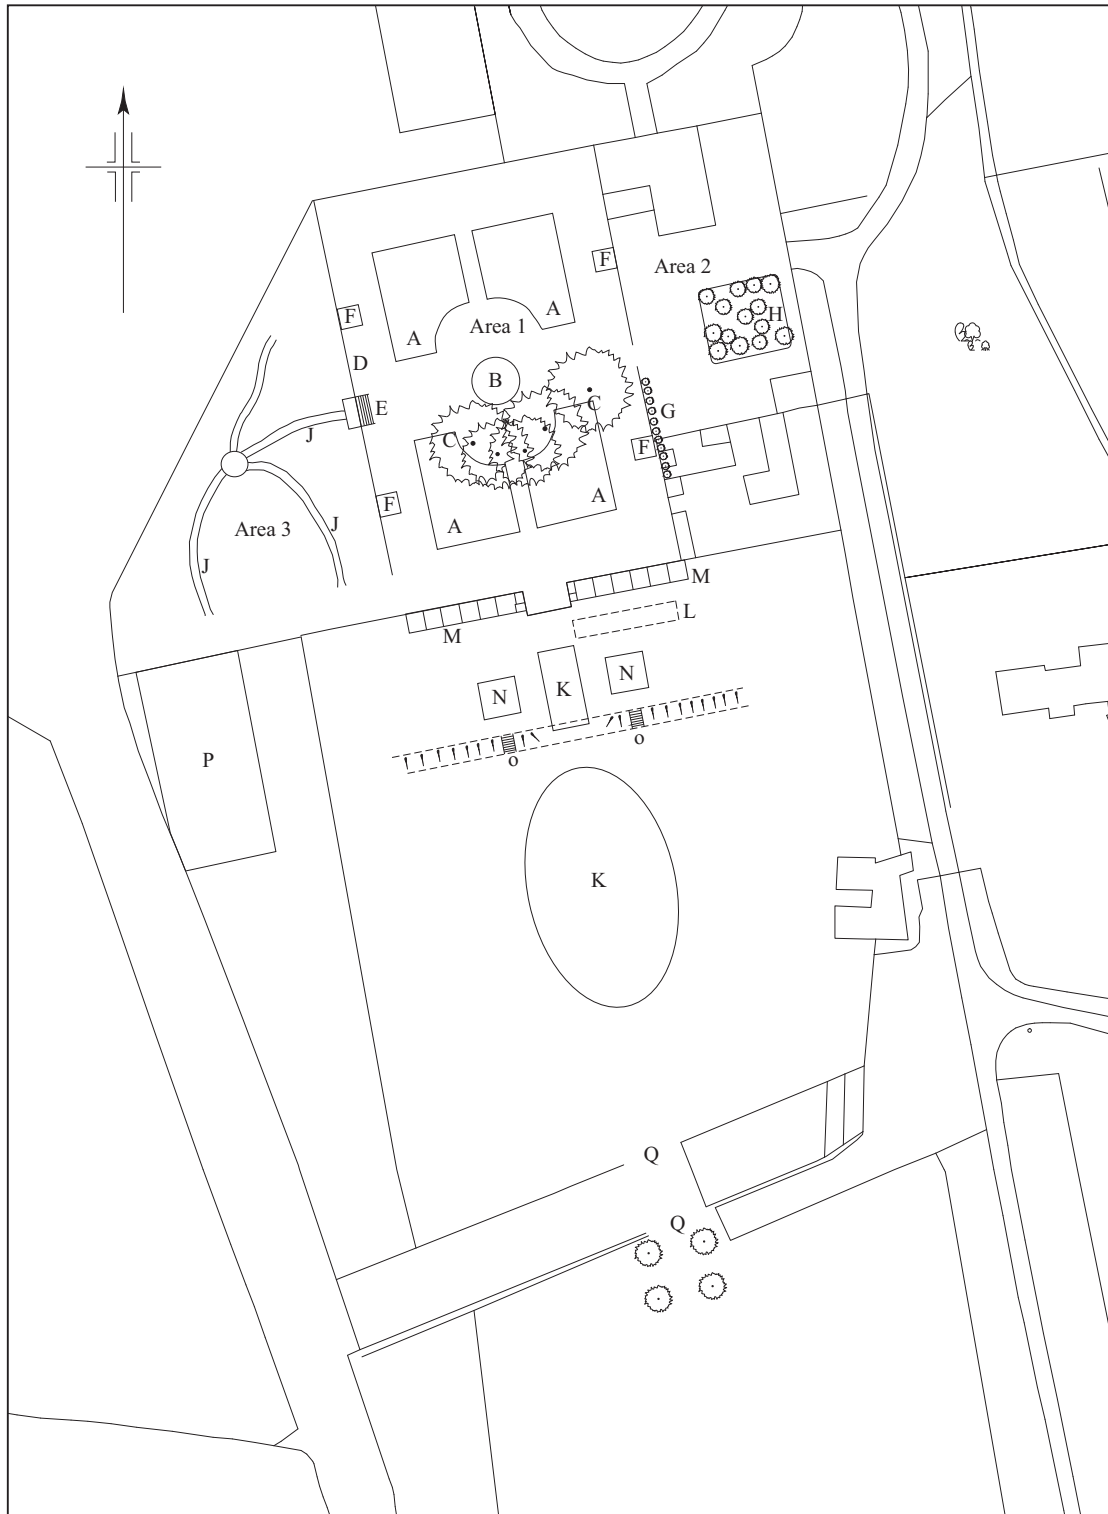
site plan showing the garden areas and the proposed works (not to scale)
